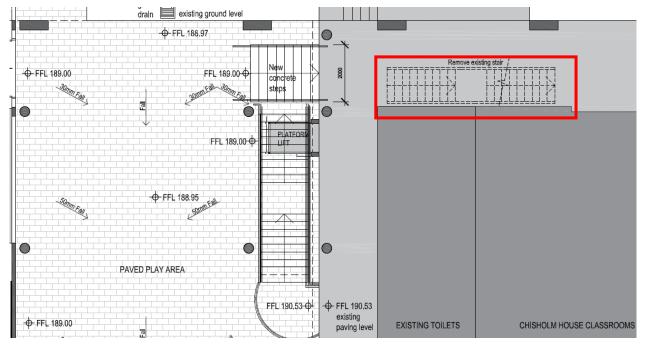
Extract of Existing Site Plan with the proposed shaded in red (Source Templum Design Architects)
